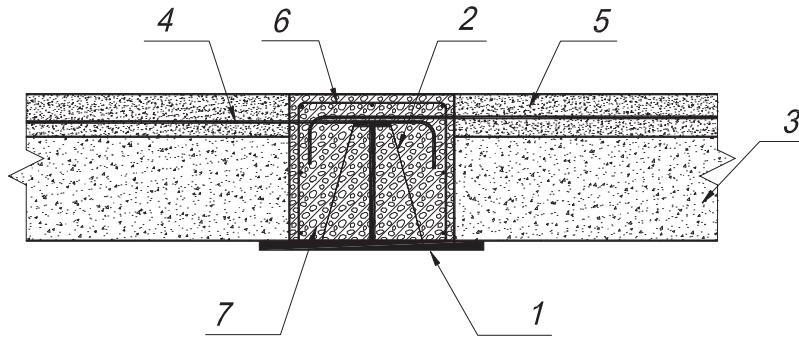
Connection joint of gas concrete ceiling slabs rest on bearing girder: 1 – composite steel section; 2 – stiffening ribs; 3 – gas concrete slabs; 4 – reinforcement bars in between-slab seams; 5 – concrete (mortar) for concreting between-slab seams; 6 – reinforcement mesh; 7 – concrete for embedding bearing girder
